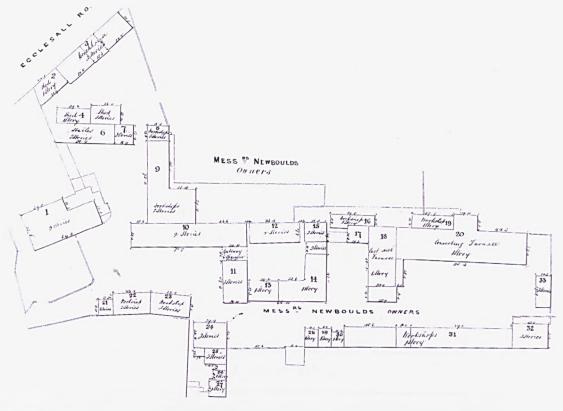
Survey of Bridgefield Works made in 1842. The premises have been augmented by a steel melting shop and converting furnace (SCA).
